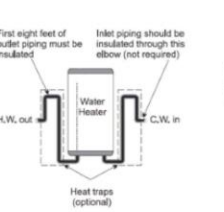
E—Heat Traps on a Tank with Connections on Bottom
